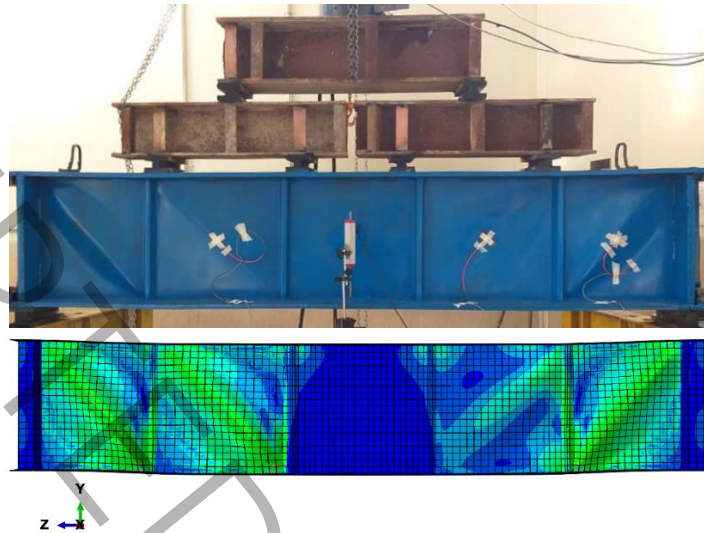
Plate girder with trapezoidal web deformations after the experiment.
